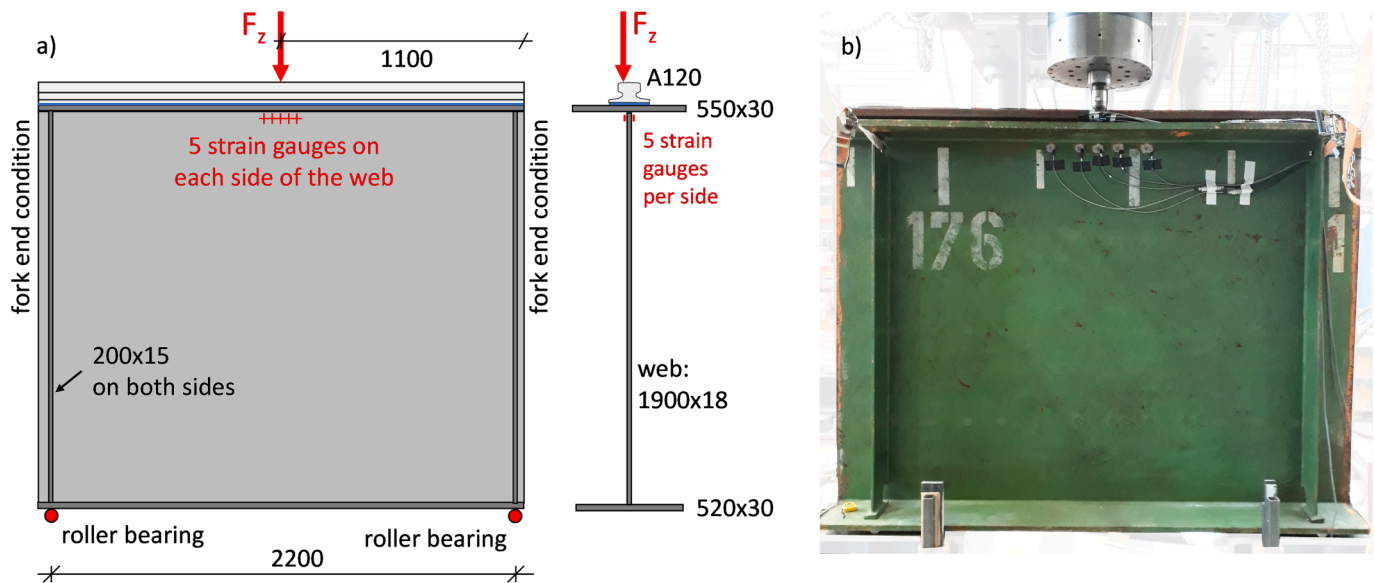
a) Geometry, support conditions and load introduction for the test girder, b) test girder in testing machine (all dimensions in mm).
